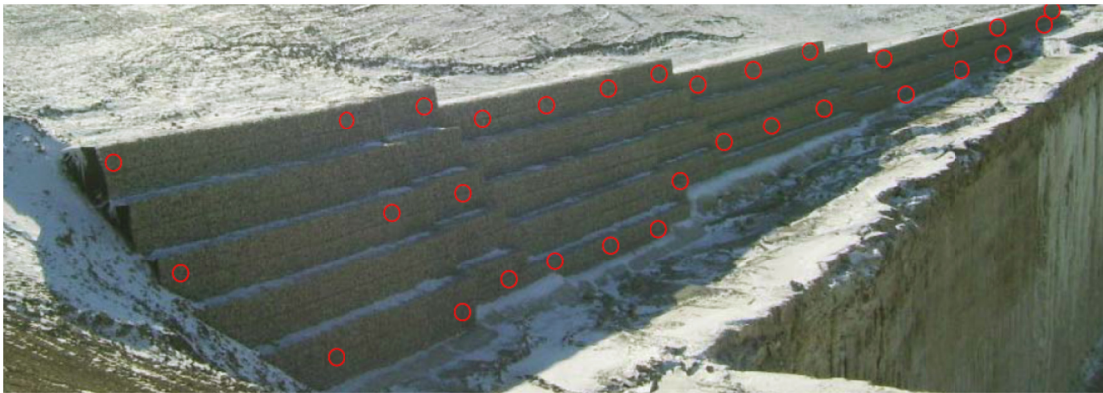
Target locations Gabion Wall at Northeast Corner of Reservoir Site
